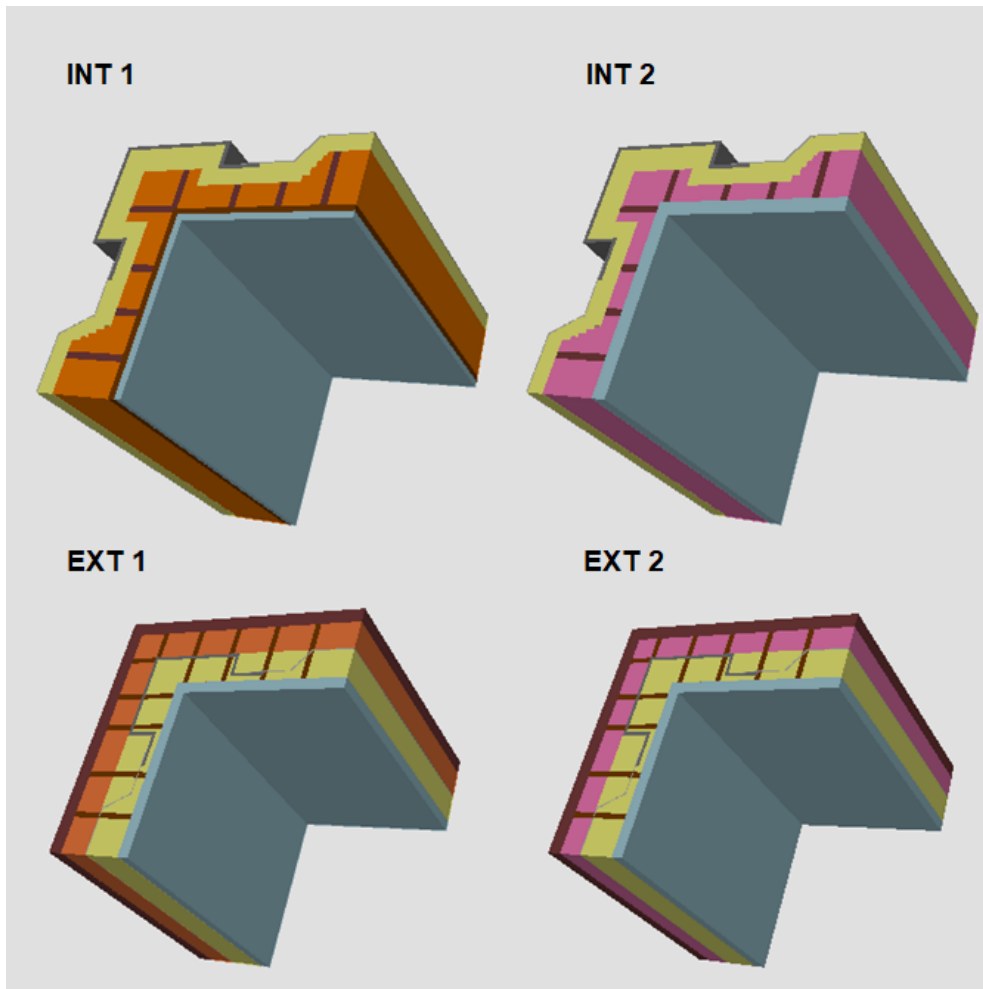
3D AnTherm wall-wall corner construction views according to Table 10
